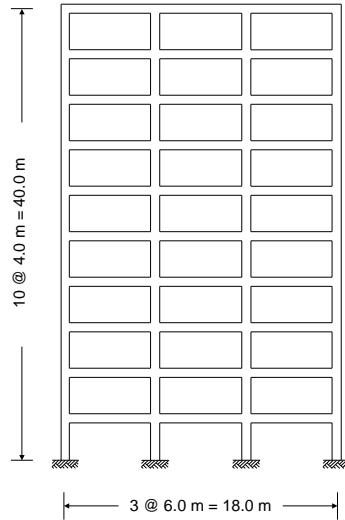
Elevation view of the transverse frame of the 10-storey building.
